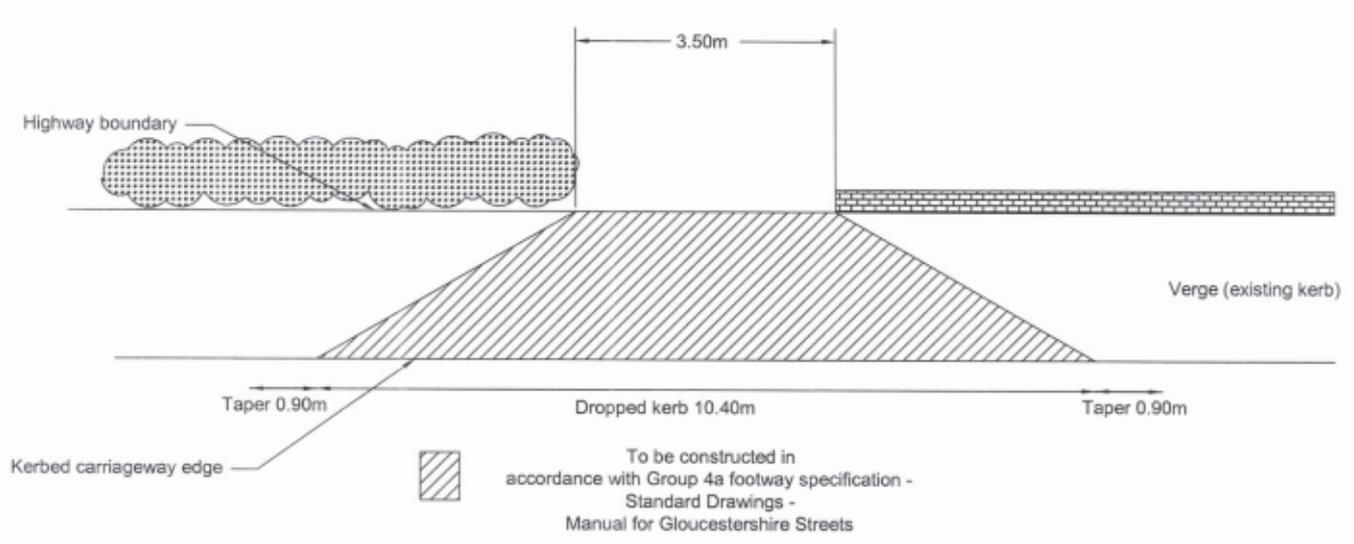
Standard access to 1 dwelling over kerbed highway verge.
